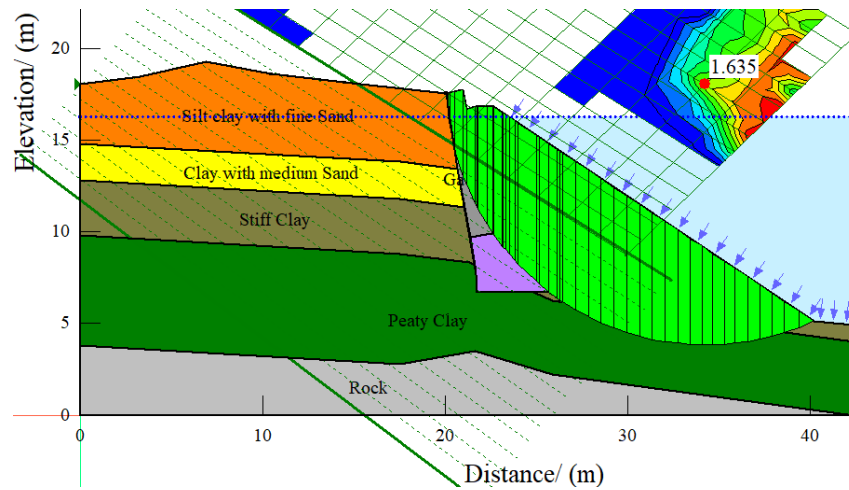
Proposed Gabion wall section (8 m X 5 m) at Location 1
